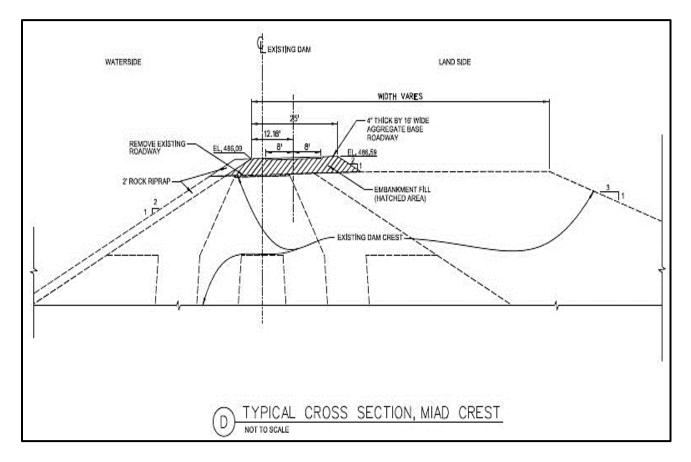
Preliminary typical cross section for 3.5-foot raise at Mormon Island Auxiliary Dam (MIAD).
